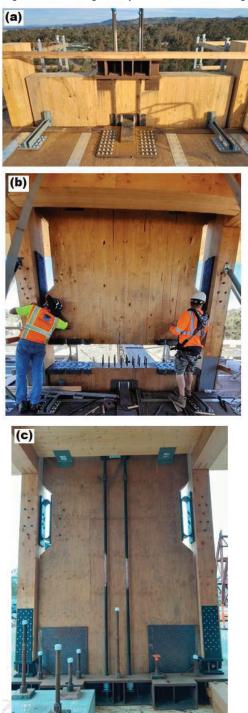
Post-tensioned rocking wall system (a) PT anchor at wall top (b) Wall splice being installed (c) foundation level detail and UFP devices
